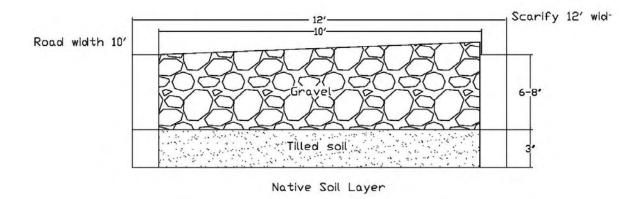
Cross-Section Drawing of Proposed Perimeter Road
